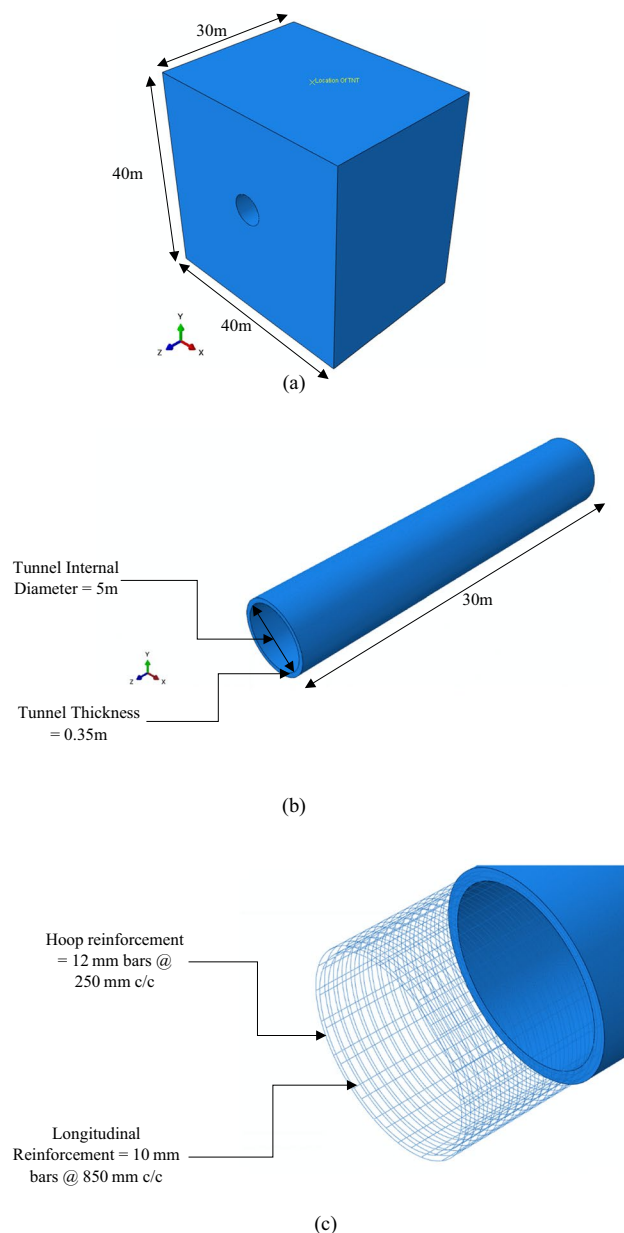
Geometry of soil-tunnel model (a) Soil model (b) Tunnel liner (c) Steel reinforcement.
